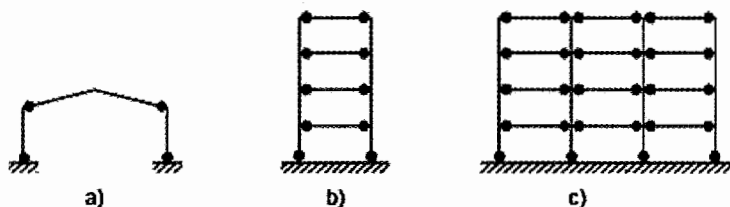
Rigid frames with dissipative zones in beams and column base joints; taken from Figure 6.1 of EC 8 [1]
